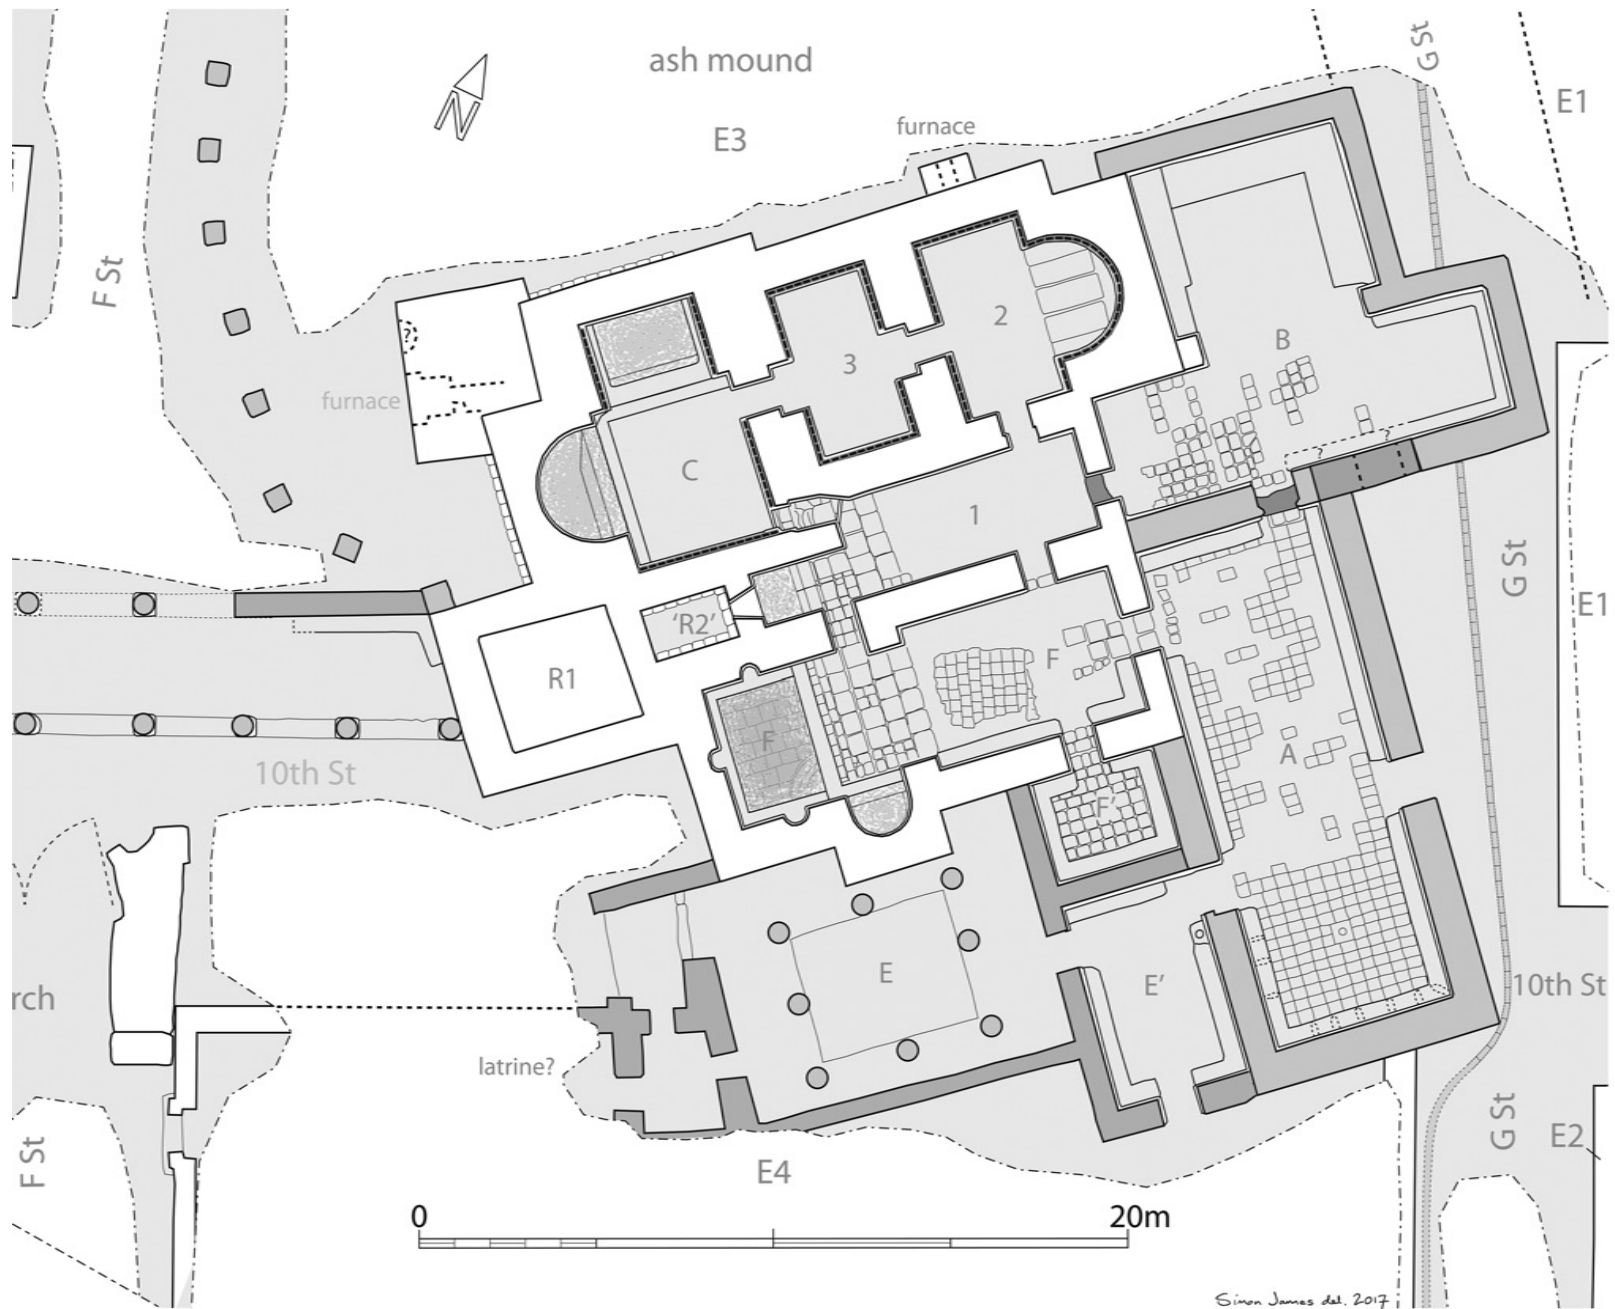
Plan of the E3 bath, based primarily on Detweiler's 1937 resurvey and plan (Neg. Y589), plus direct observations and TS survey points. The wall tones follow Detweiler, distinguishing the brick/concrete bath block from the surrounding mortared-rubble structures, walls with mud-brick superstructure.
